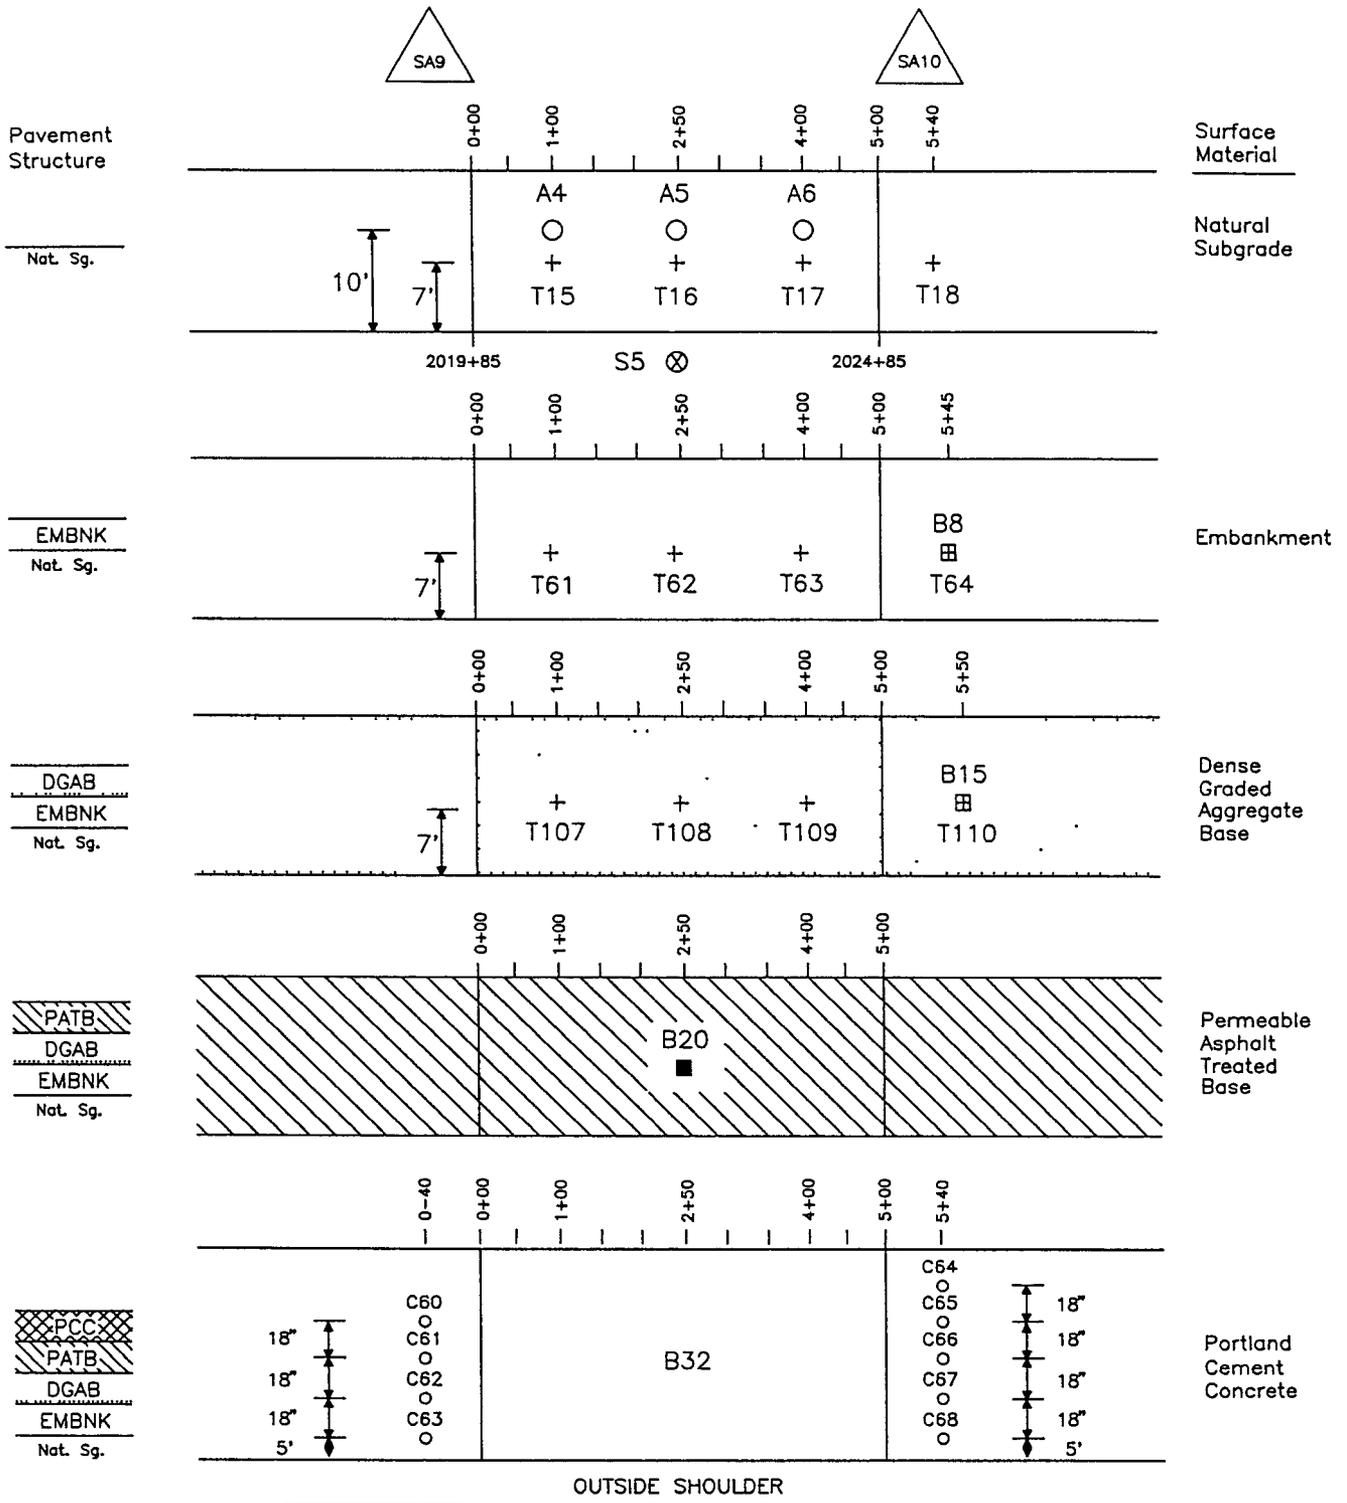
Sampling and test plan for test section 530211, SPS-2 Washington
